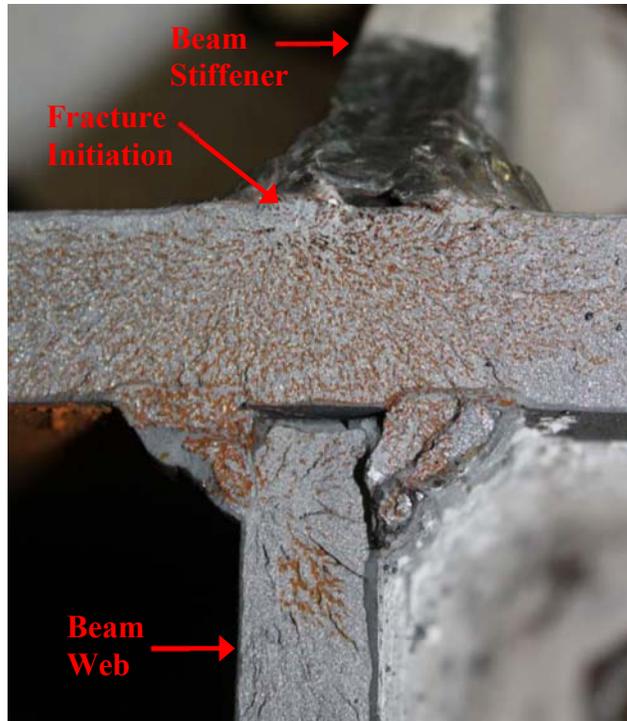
Specimen 12ES-1.25-1.50-44 Fractured Flange
